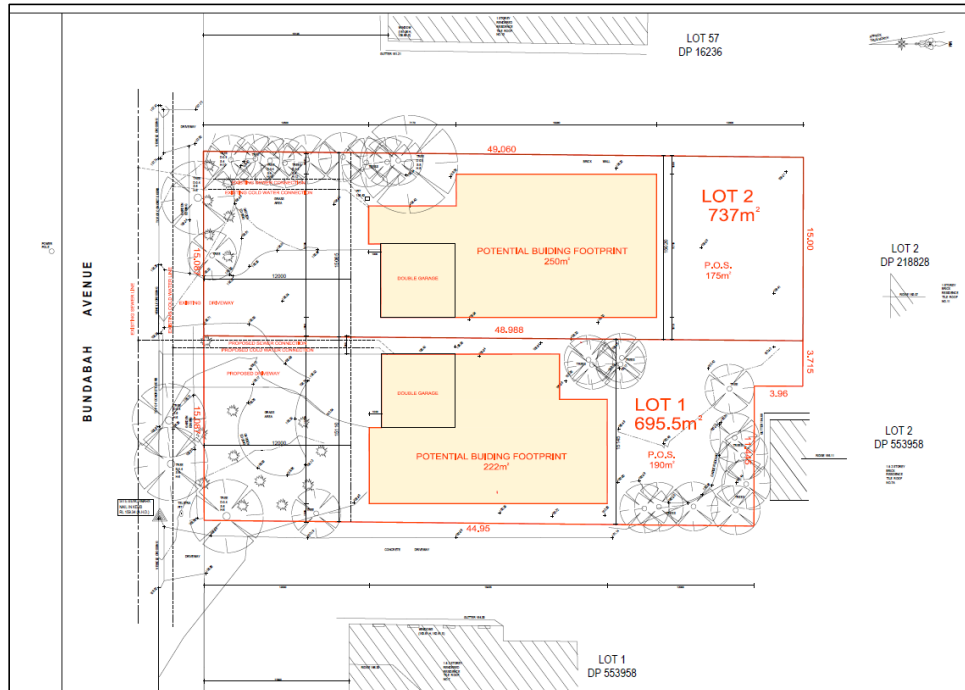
Proposed subdivision plan (Corona Projects, 2025)
